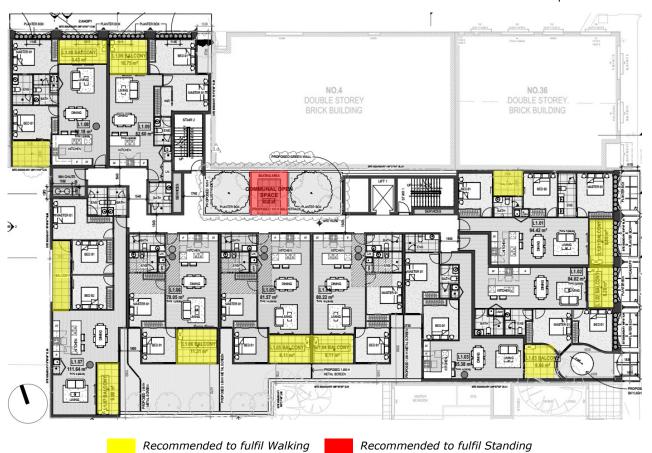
Level 1 plan with recommended wind criteria overlaid.
